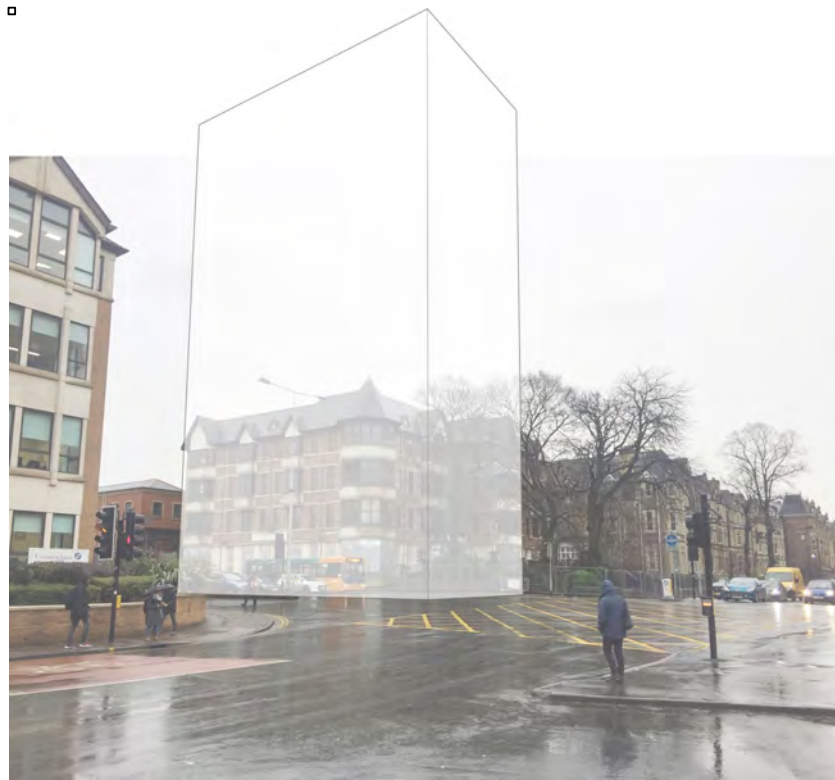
View to SE towards development area from Gorsedd Gardens (PGW Gm 26) showing scale of proposed building (Street View 3, Feilden, Clegg, Bradley Studios 2017, 28).
